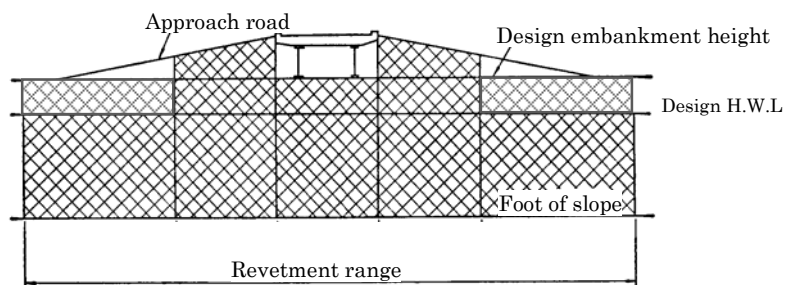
Necessary Height of Embankment Revetment in Line with Bridge Construction
